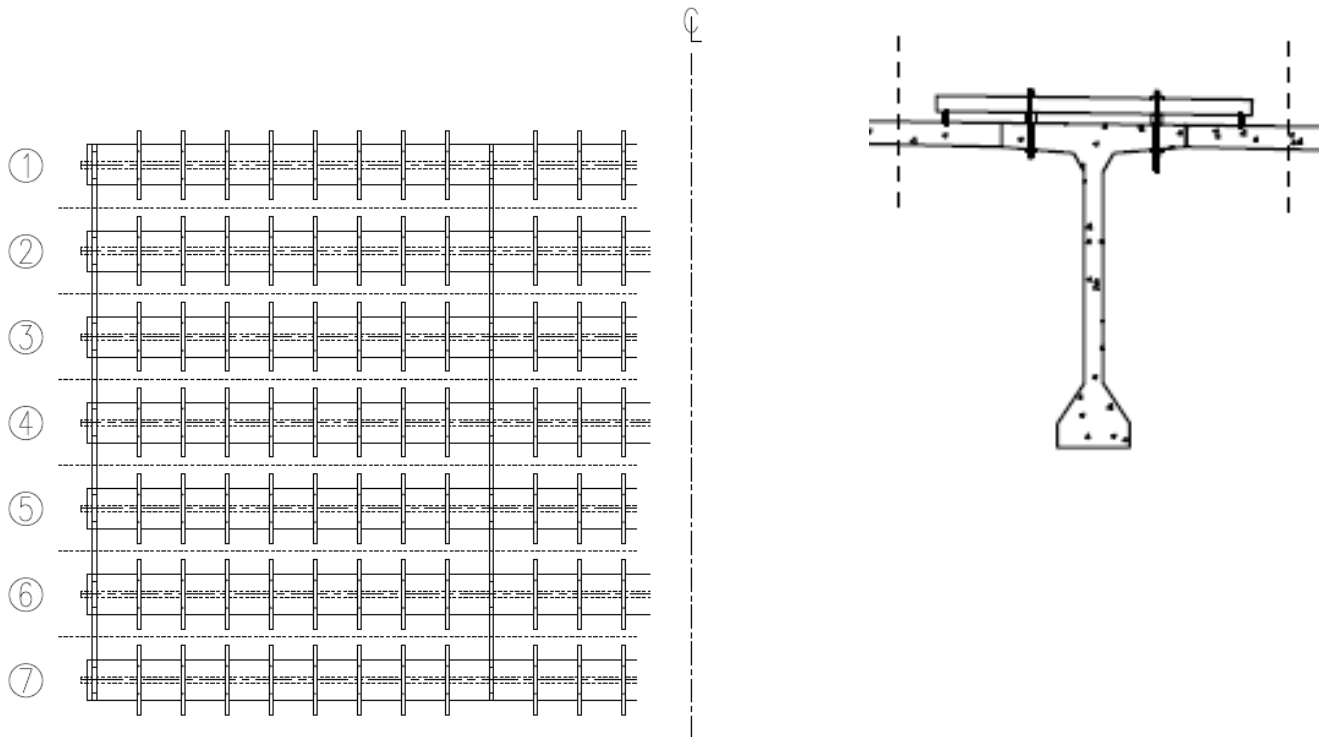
Concept of slab support system: Plan view of the 7 girders (left) and cross section of one girder
